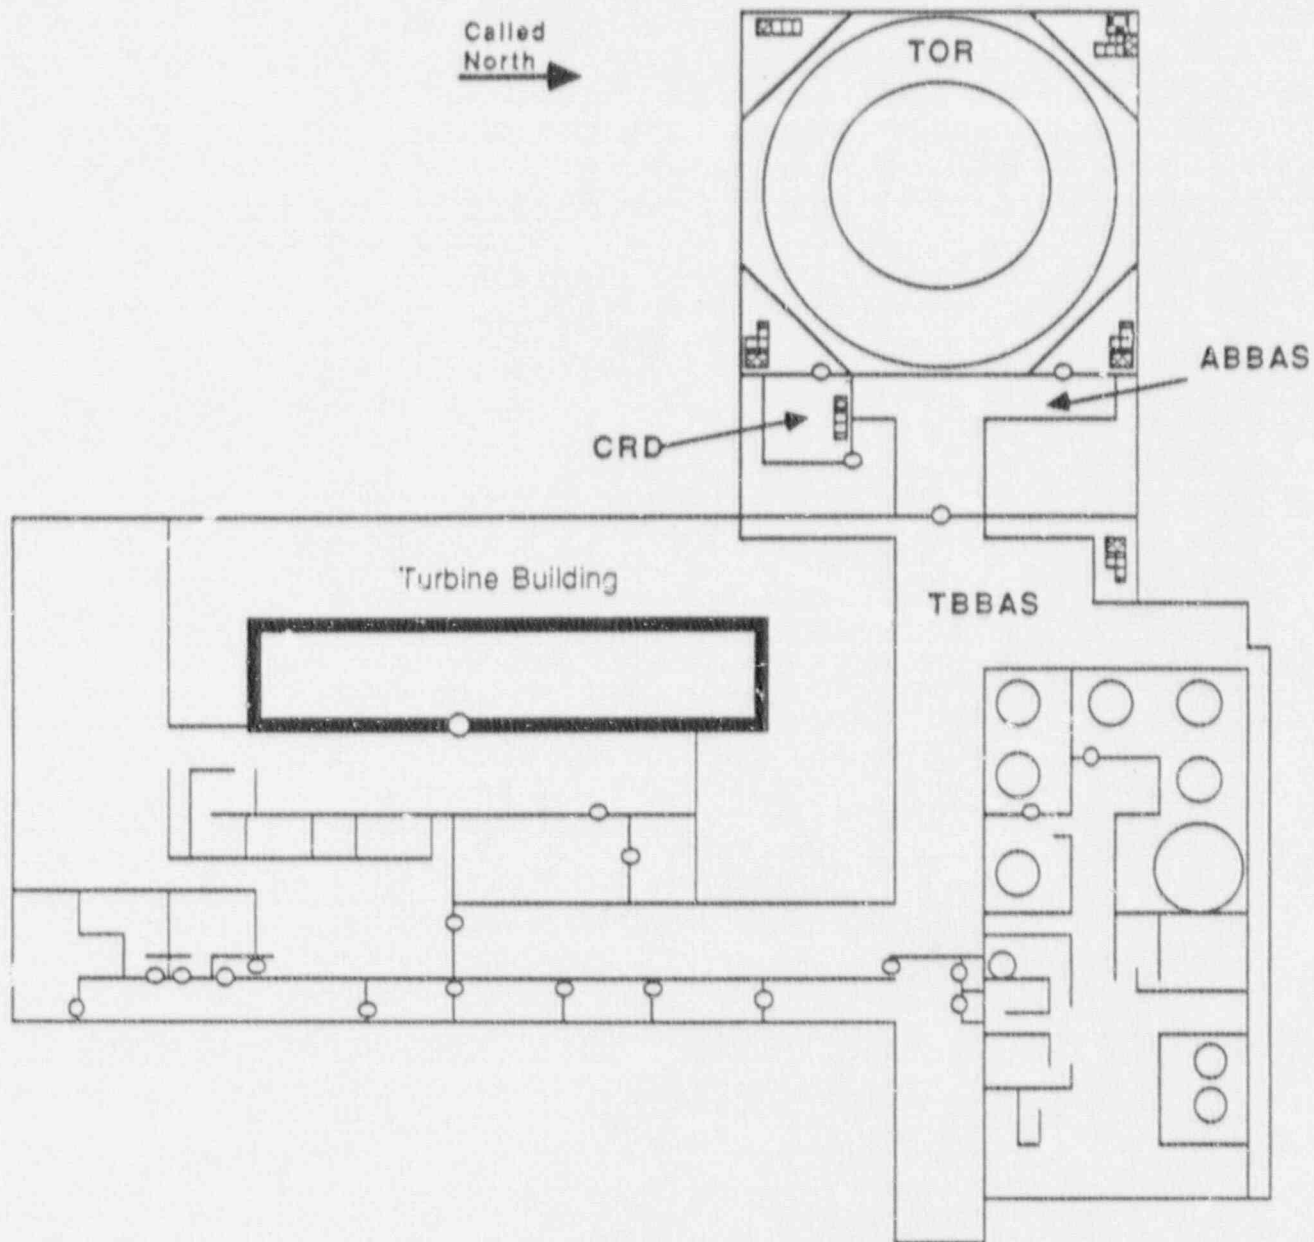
Enrico Fermi Unit 2 - Reactor Building - 684 ft. Elevation and Auxiliary Building - 677 ft. Elevation
